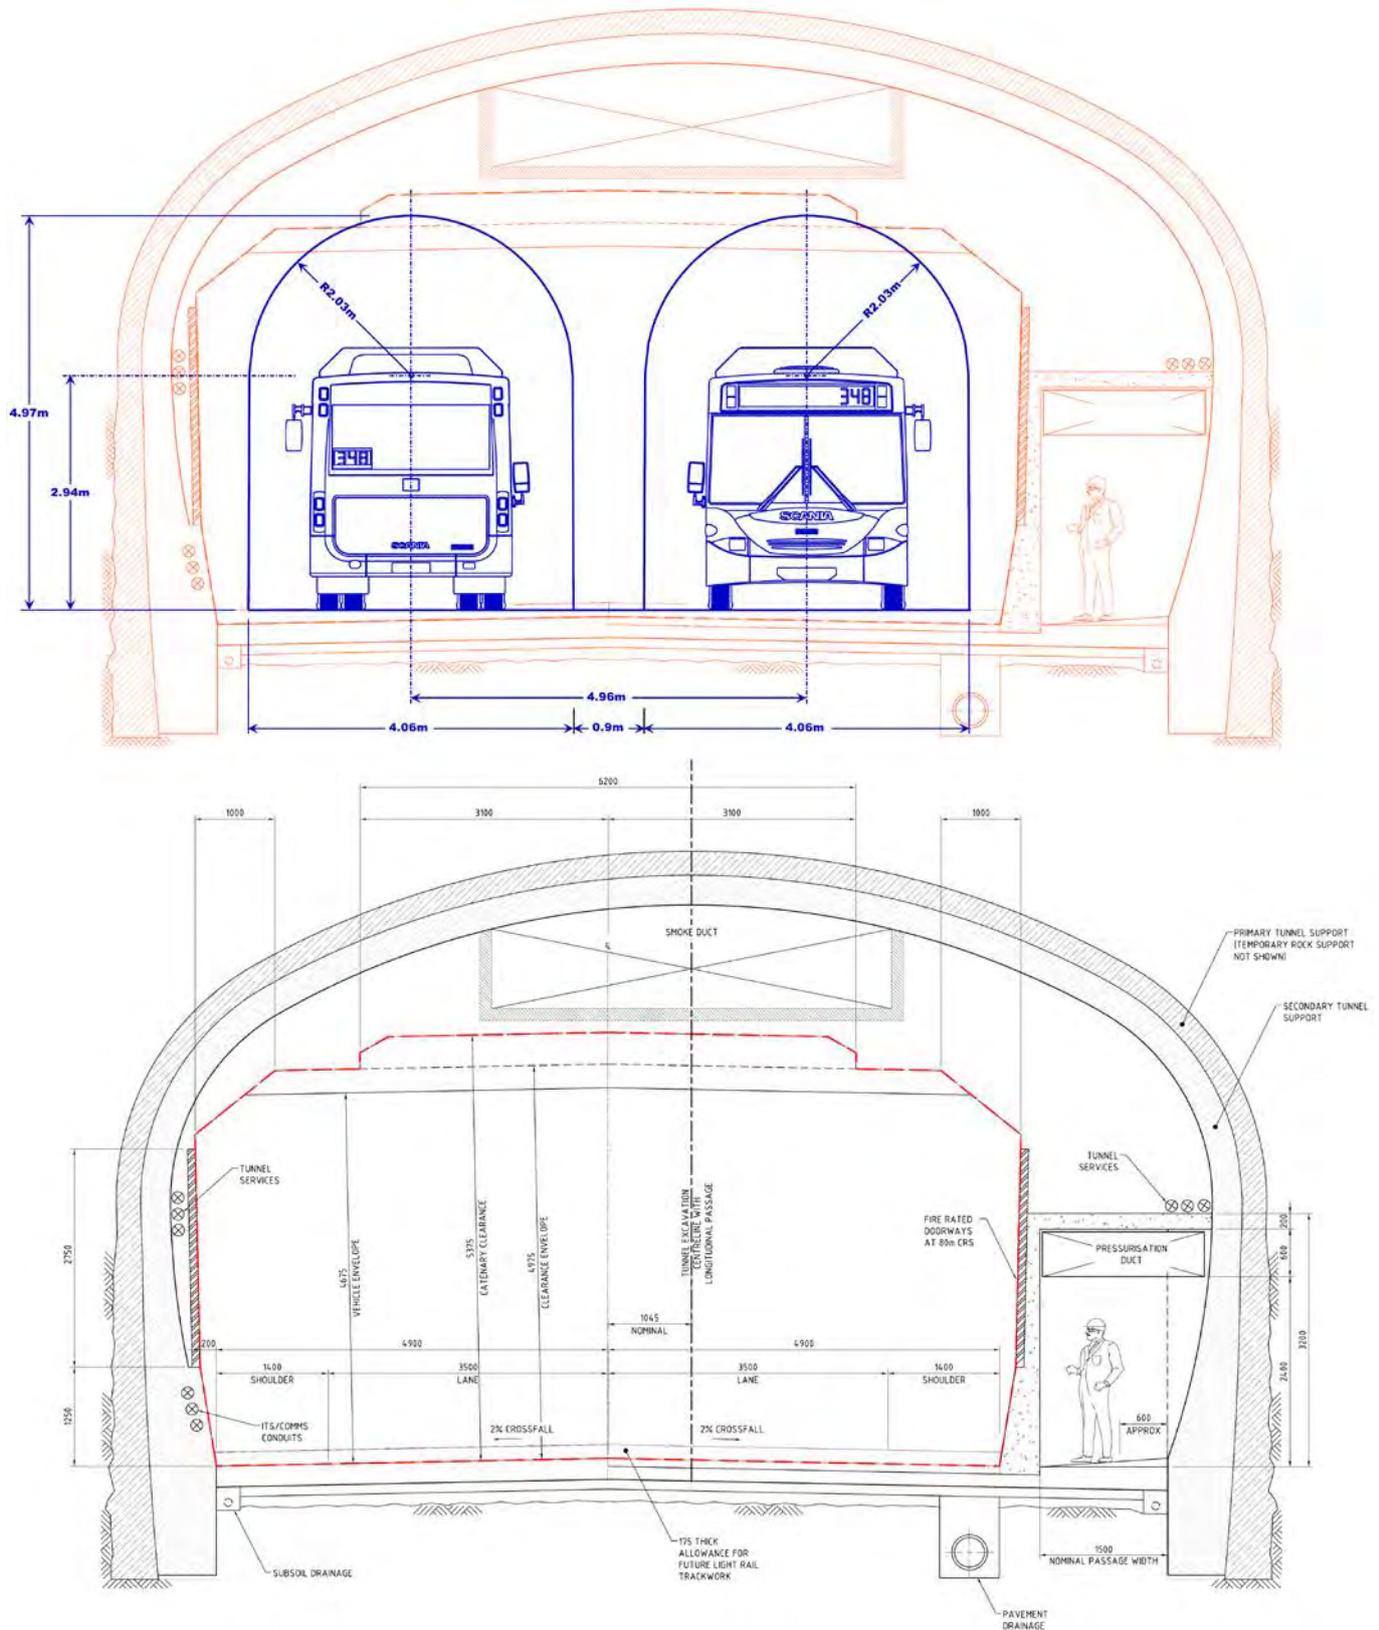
Comparison of Wynyard Tram Tunnel and Brisbane Busway Tunnel Sections
